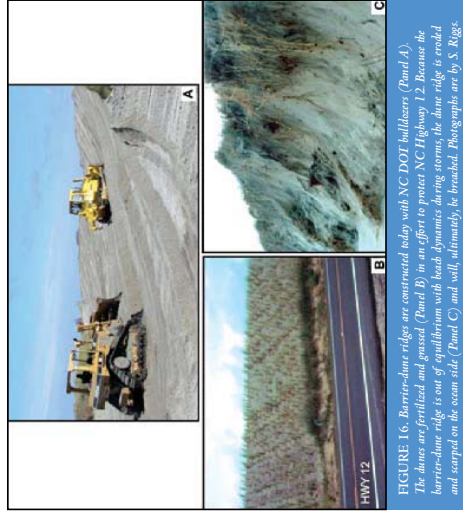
Barrier-dune ridges are constructed today with NC DOT bulldozers (Panel A). The dunes are fertilized and grassed (Panel B) in an effort to protect NC Highway 12. Because the barrier-dune ridge is out of equilibrium with beach dynamics, during storms, the dune ridge is eroded and scarped on the ocean side (Panel C) and will, ultimately, be breached. Photographs are by S. Riggs.
